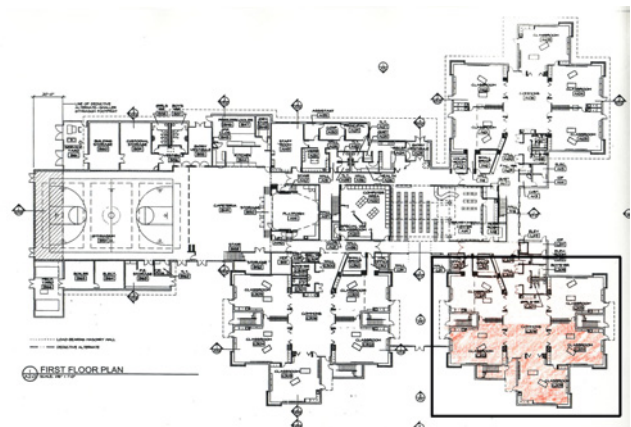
Floor plan of Southside Elementary in Eugene, OR
